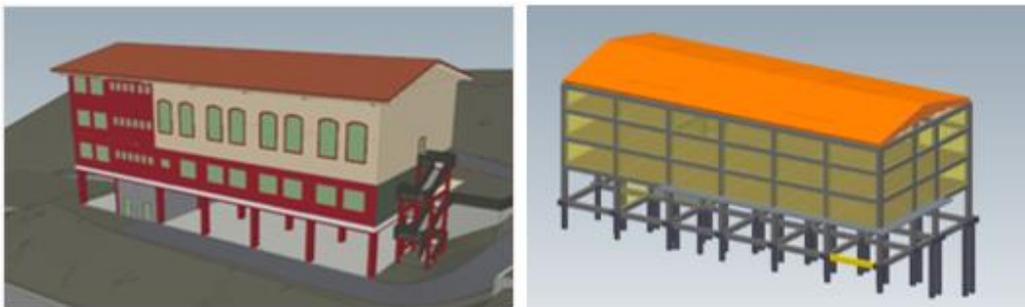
BIM architectural and structural models of the new school in Montemarano.
